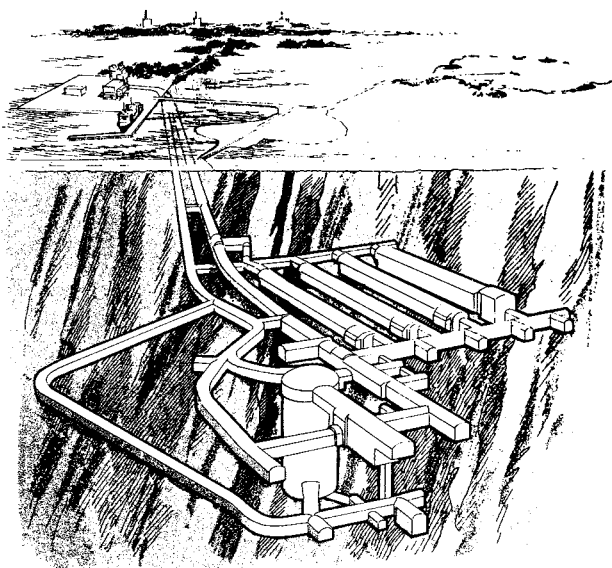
Overview of tunnels and storage chambers in the first construction stage.
